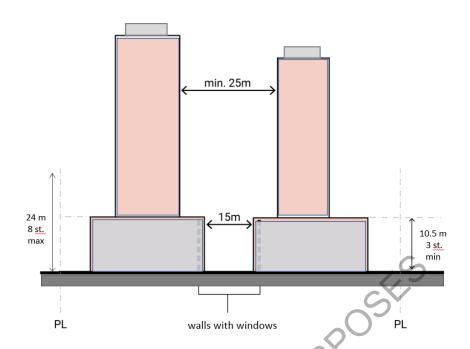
a. Tower separation distances between two point tower high-rise buildings on the same lot.
